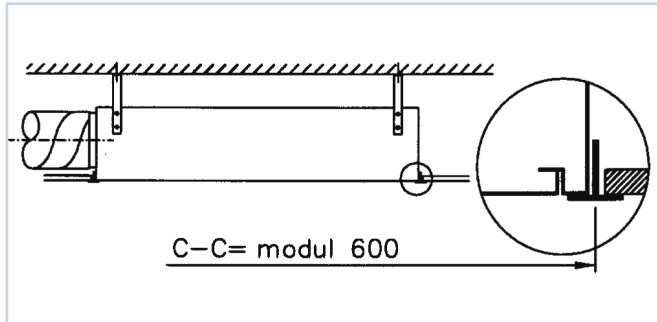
Installation in ceiling, designed to fit T-profile ceiling system.
